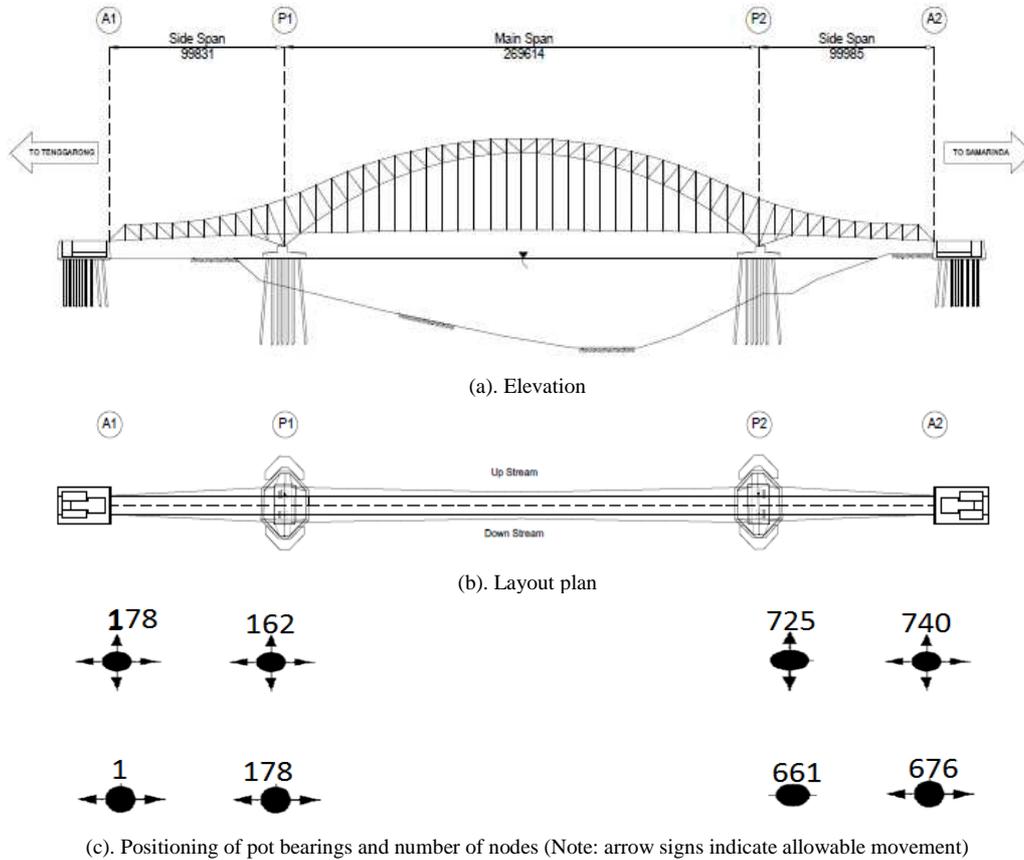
Elevation, layout plan, and pot bearing positionings of the bridge
